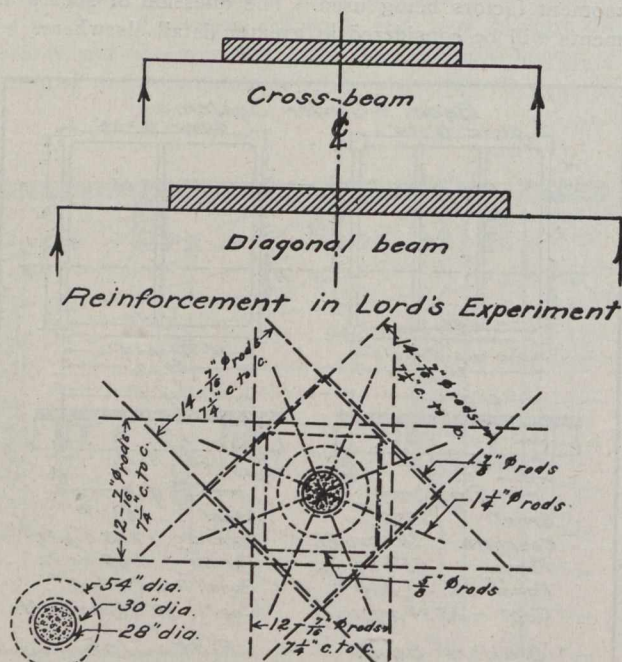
Column Used in Lord's Test, Showing Reinforcing.
